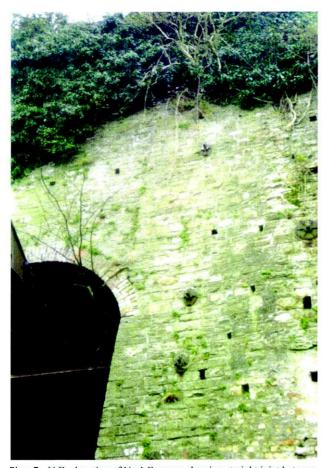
N.E. elevation of No.1 Furnace, showing straight joint between furnace and high vault.
